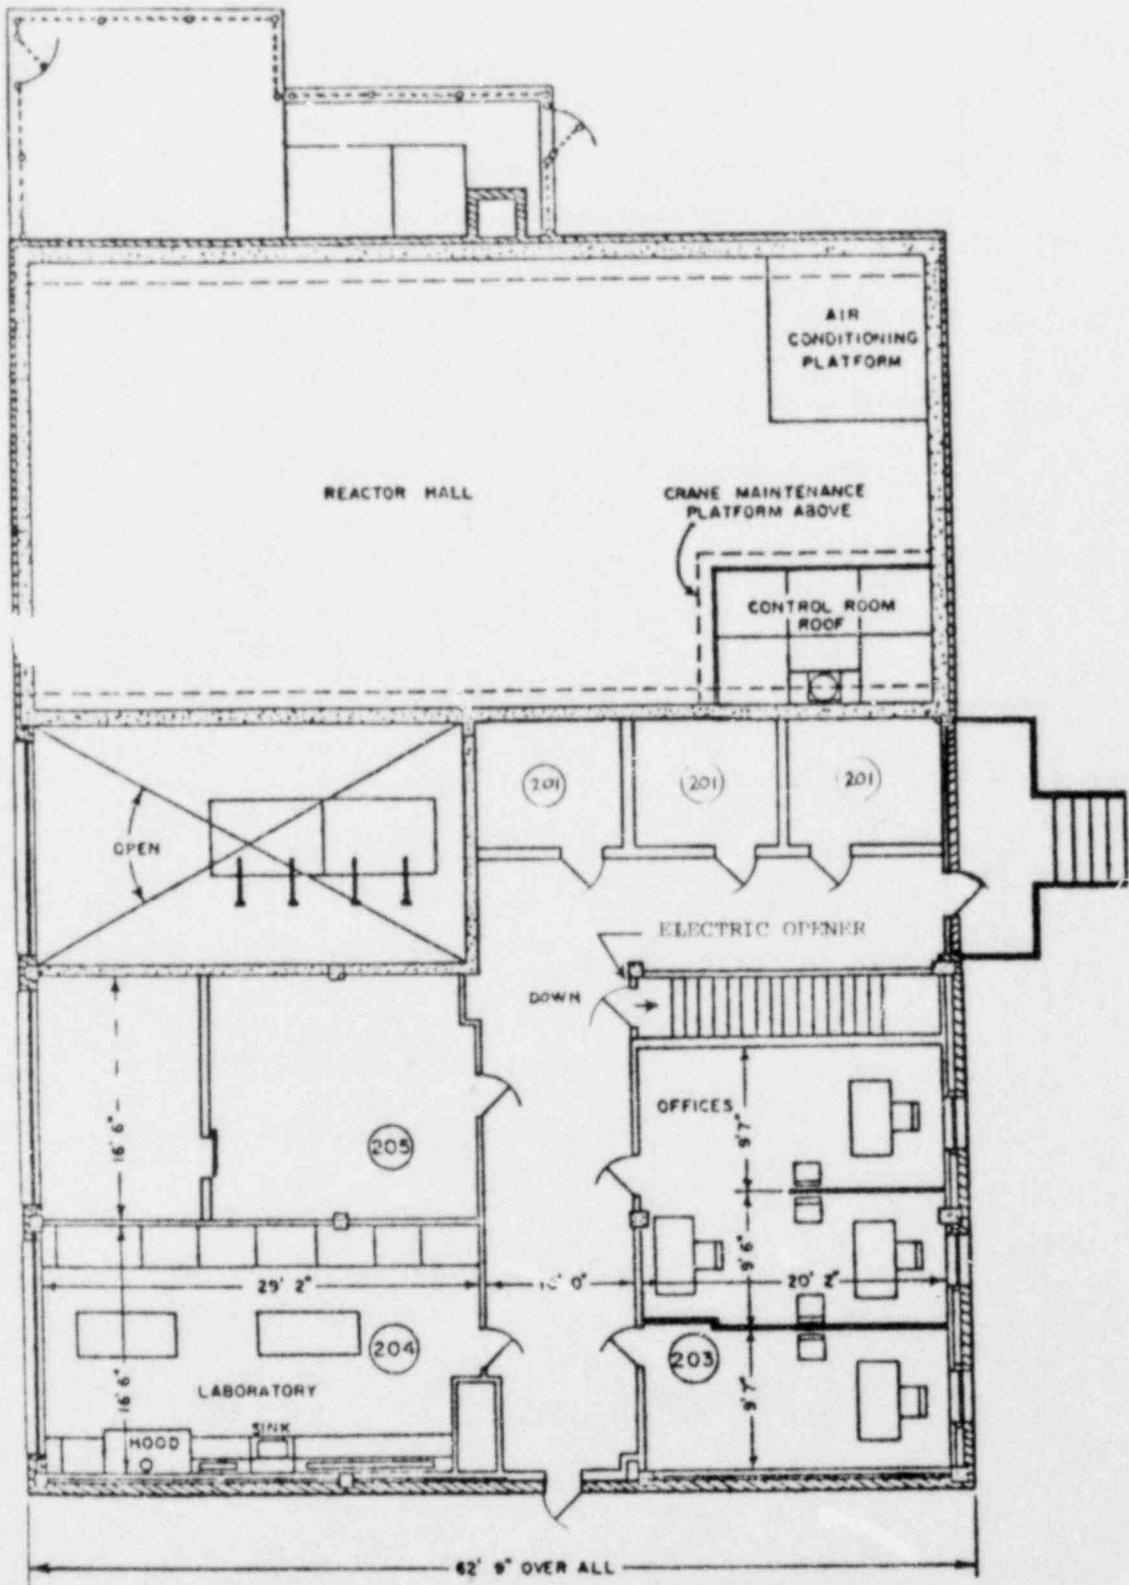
Second Floor Plan for the University of Florida Training Reactor Building
